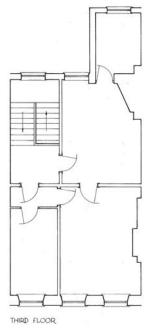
1990 survey plan showing the third floor layout prior to the 1990 building work.
